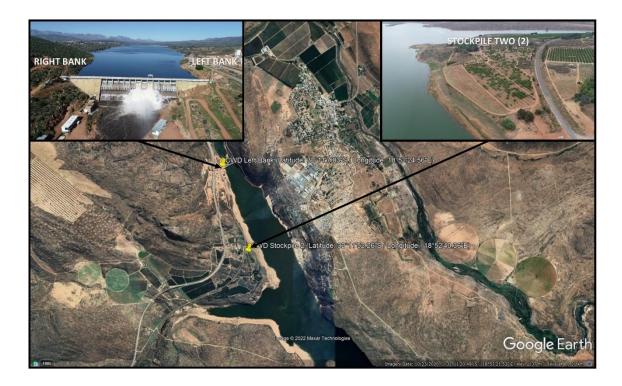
Overall aerial photo from dam wall and upstream left bank embankment stockpile area
